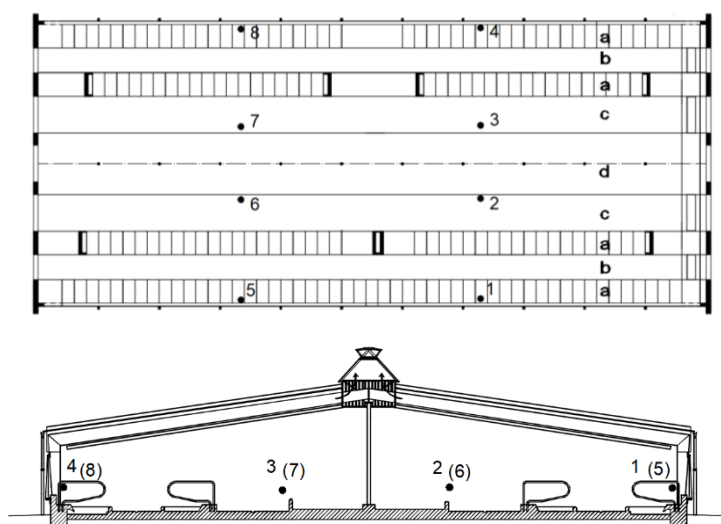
Ground plan and cross-section of the stable (A and B) with air sampling locations
